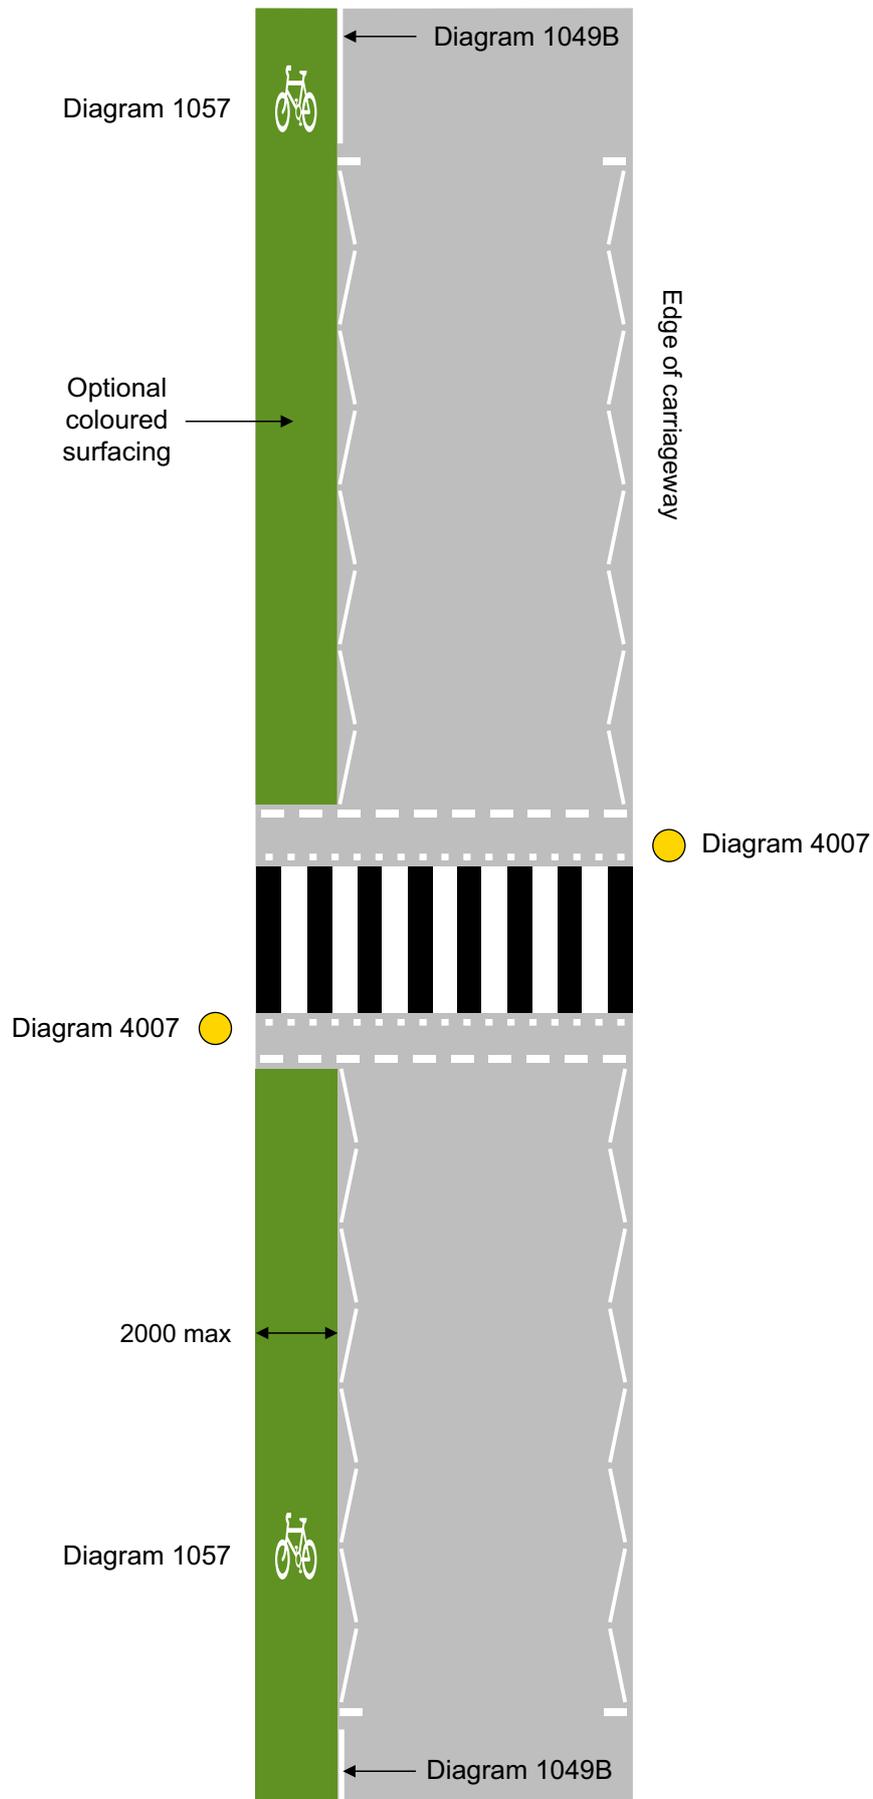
Road marking layout showing zig-zag markings offset from the edge of the carriageway at a Zebra crossing, permitting cyclists to ride behind them
